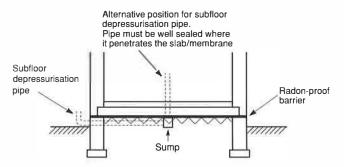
Radon-proof barrier in in-situ or ground-supported concrete floor
